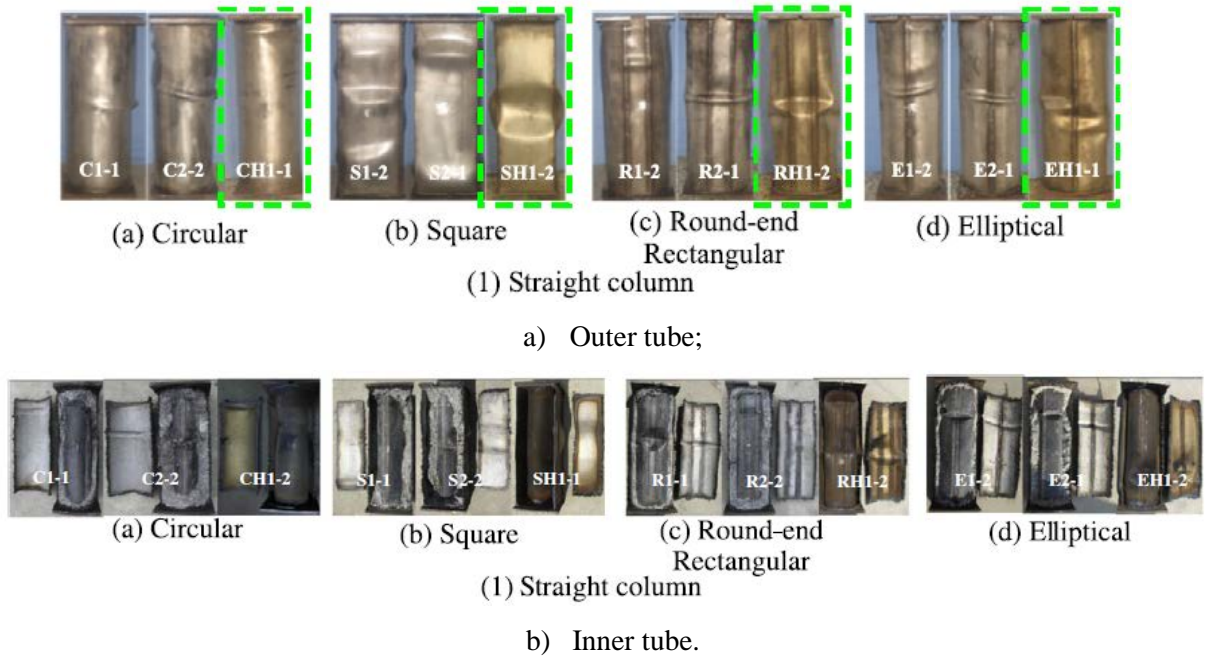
Typical failure modes for the straight CFDST columns [46].
